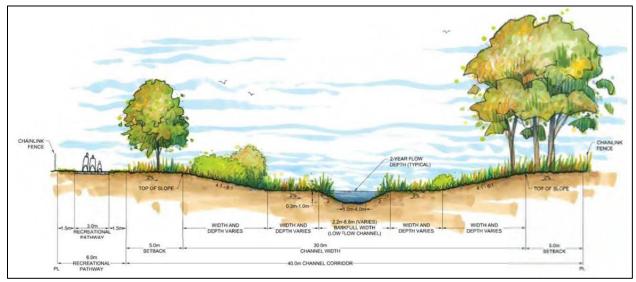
Excerpt from Kanata North Community Design Plan - Cross Section of Creek Corridor
